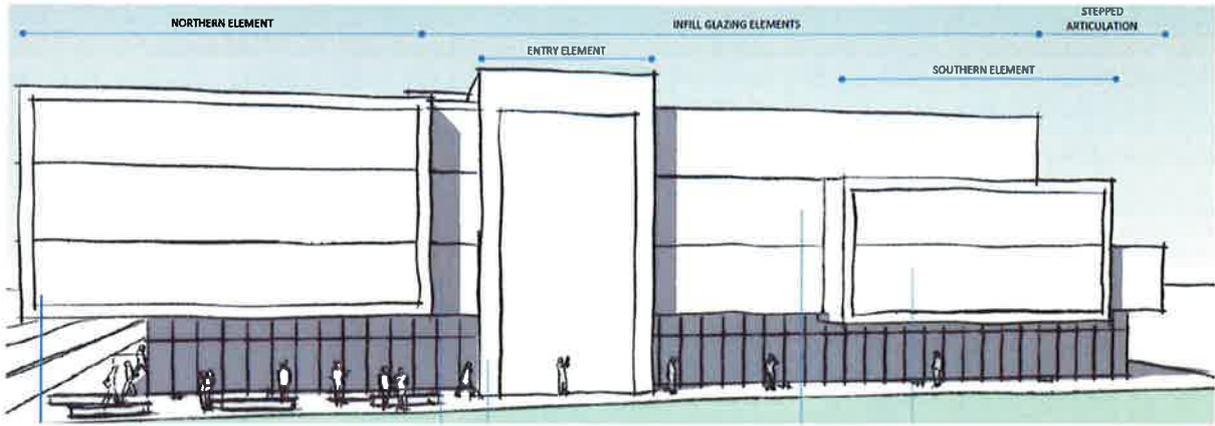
Indicative western facade facing St Matthew's Church and Botany Road (Source: Planning Proposal & BuiltConsult Pty Ltd)
